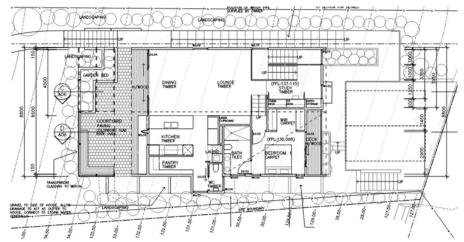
Upper Floor Main Dwelling (Steven Spizick Architect, 2021)
